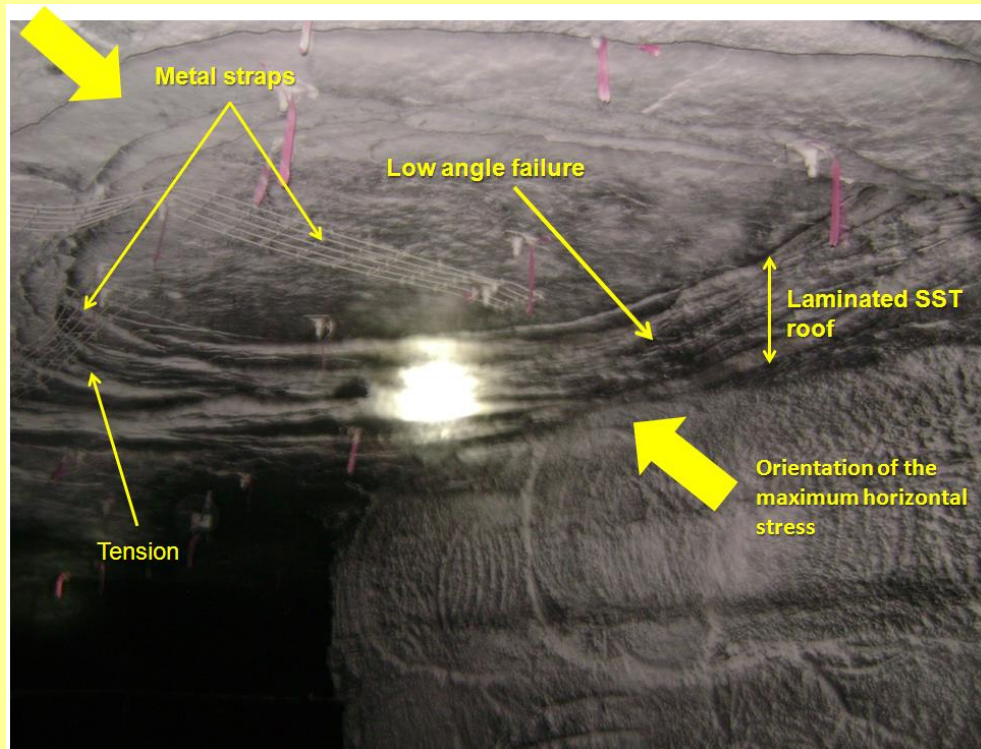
Picture showing guttering at Arnot Colliery and how metal straps are used in tandem with roof bolts in order to prevent the guttered roof from peeling off
